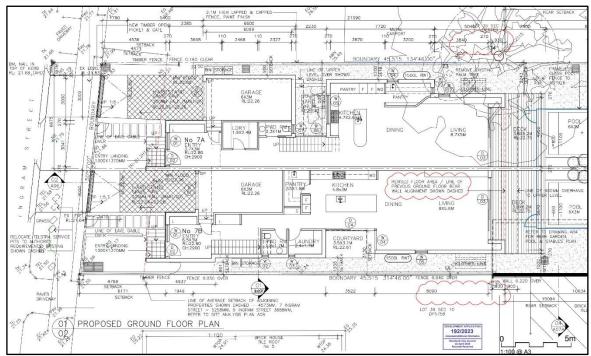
Ground Floor Plan – Attached Dual Occupancy
